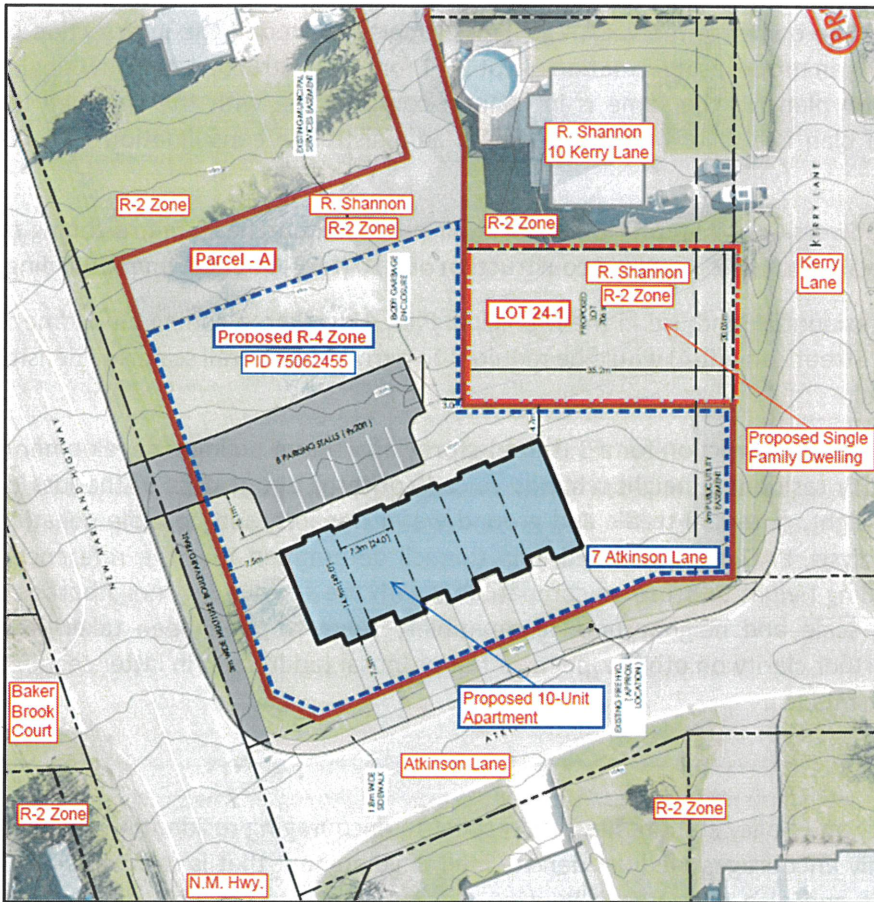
Preliminary Site Plan Concept – 7 Atkinson Lane
